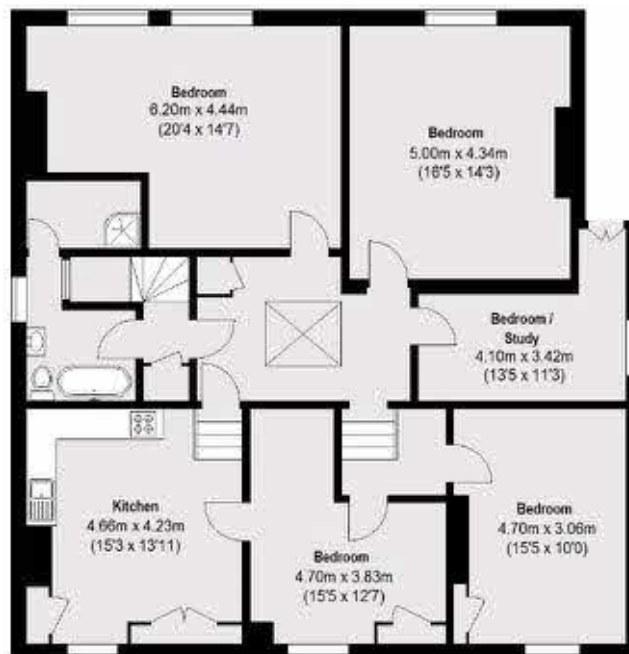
Second floor plan of house (i.e. Flat 90A) provided by Snellers Estate Agents.
